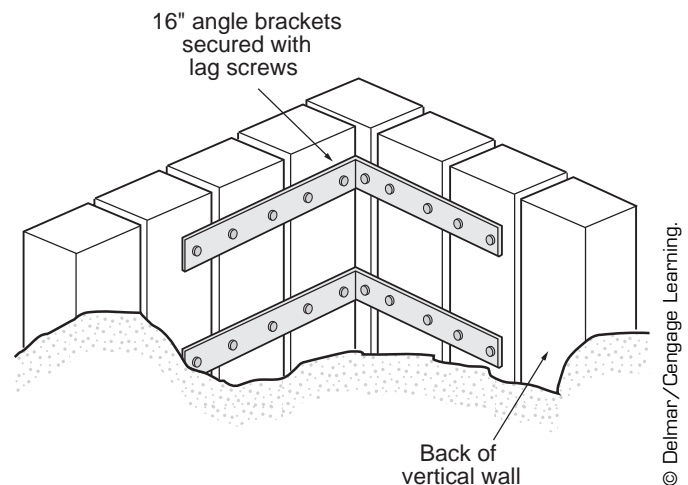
Timber retaining wall with all timbers buried vertically. Elevation of tops are staggered for interest.
